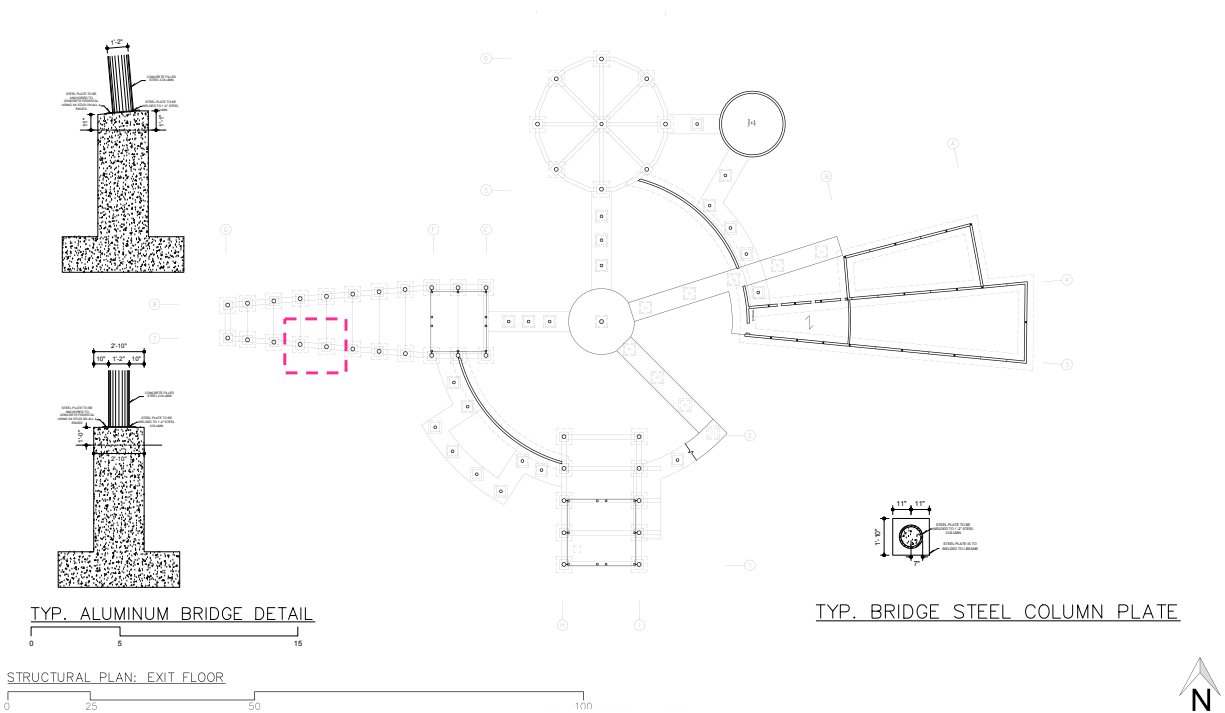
Structural Exit Floor Plan, Typ. Aluminum Bridge Details & Typ. Bridge Steel Column Plate. Diagram by student Reinaldo E. Hernandez Arcena.
